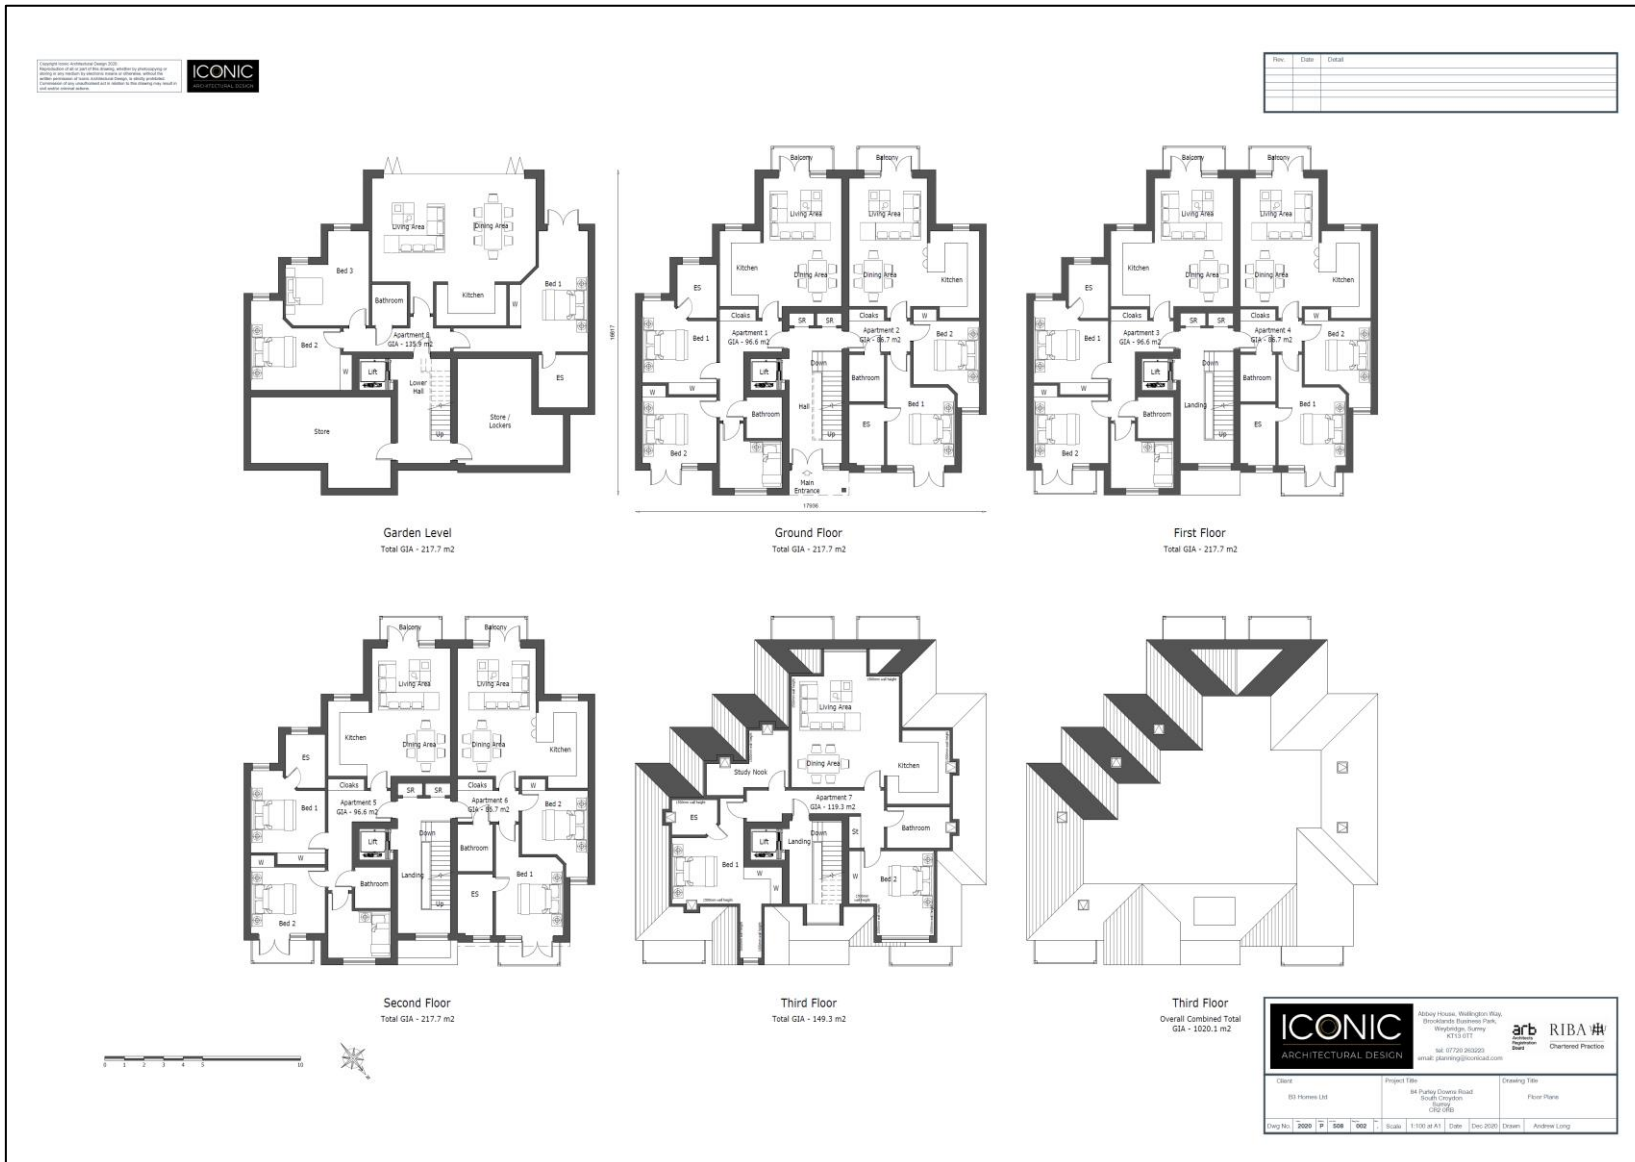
Proposed ground and first floor plans (Reproduced by courtesy of the client)
